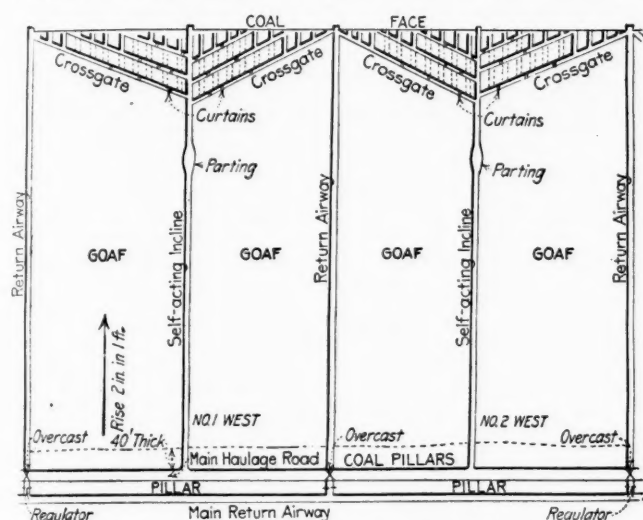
PLAN SHOWING TWO LONGWALL DISTRICTS
